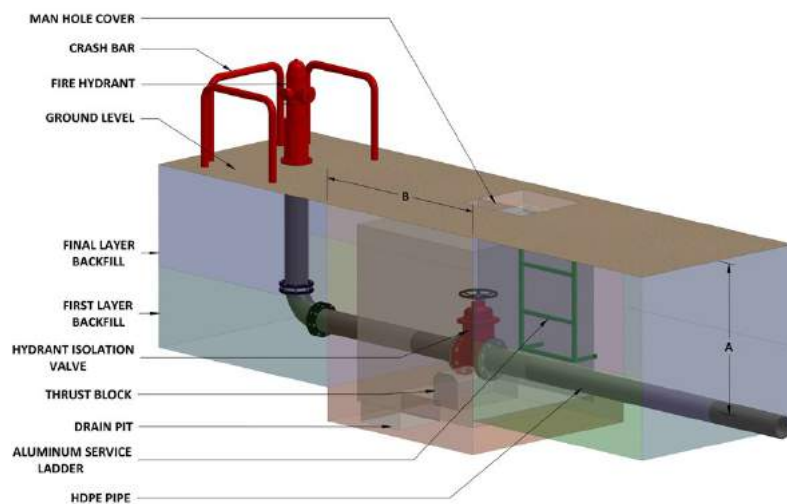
Hydrant Isolation Valve Chamber and Typical Hydrant Installation
